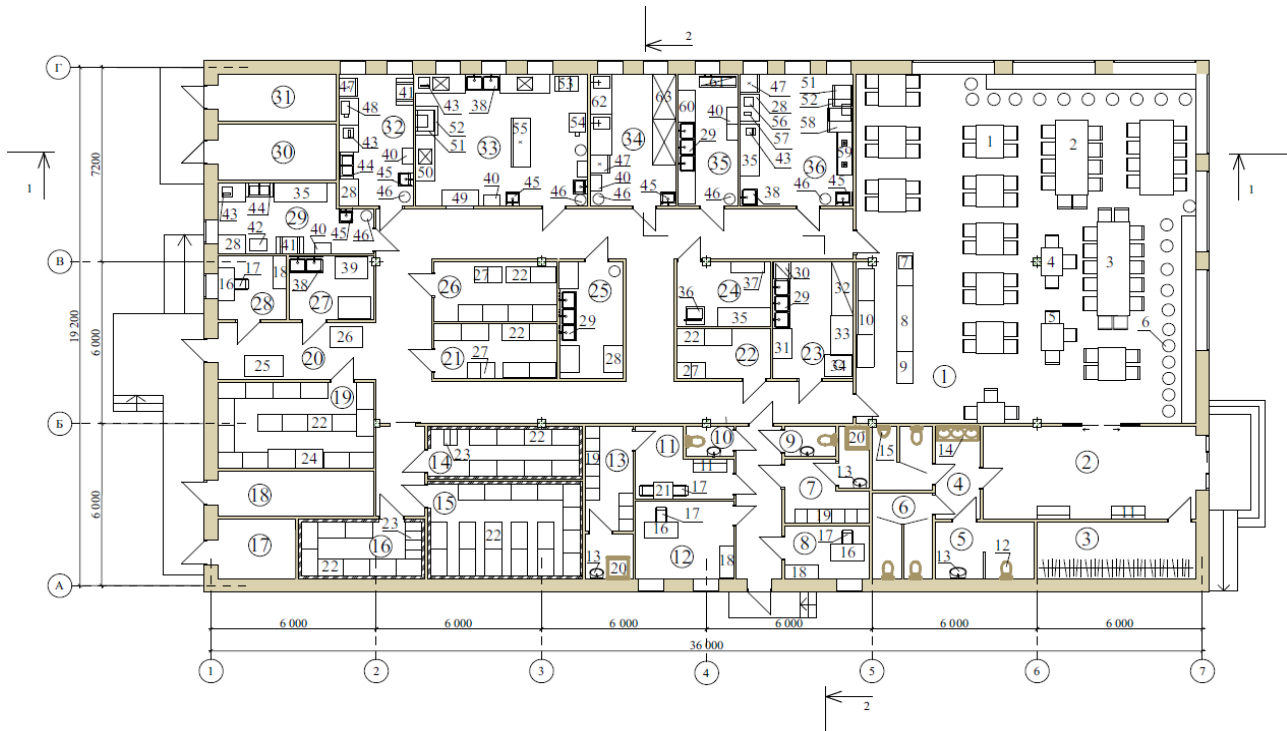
Floor plan at elevation 0.000 of a foodservice enterprise. Room legend:
